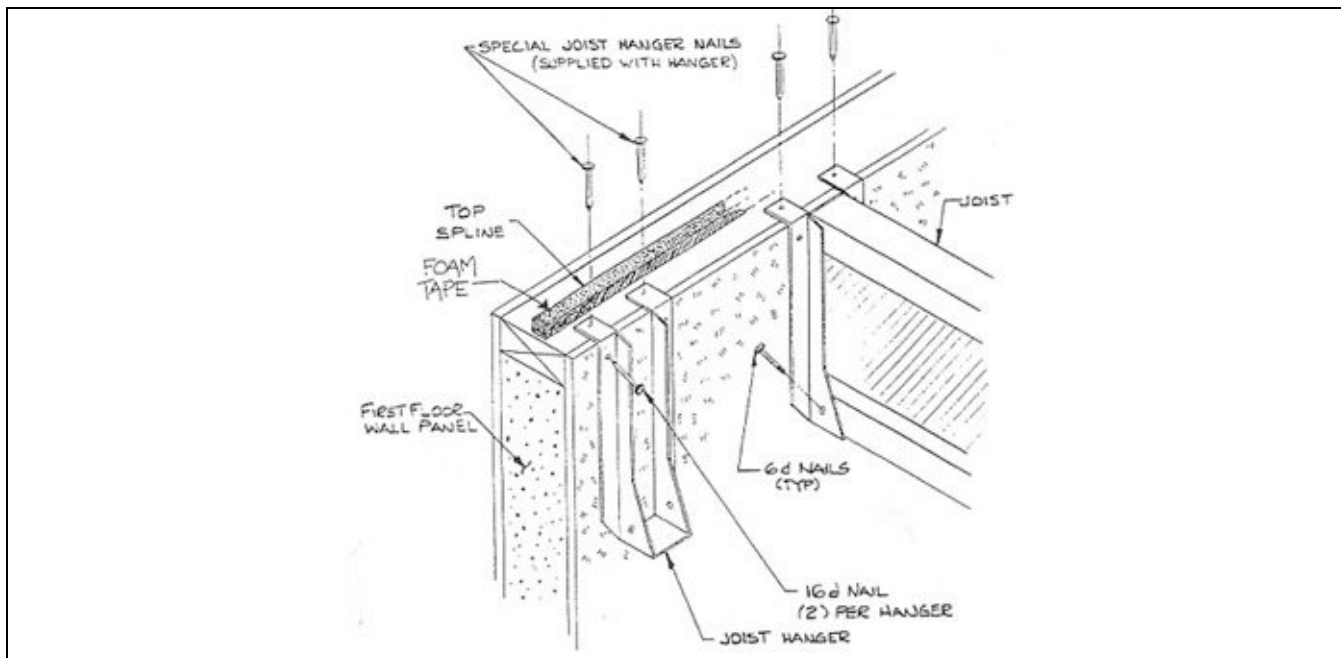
Setting Joist Hangers for Second-Floor Deck: The second-floor deck is "hung" from the continuous top splines that were set into the wall panels. Follow joist hanger manufacturer's instructions, and use nails supplied with the hangers.
